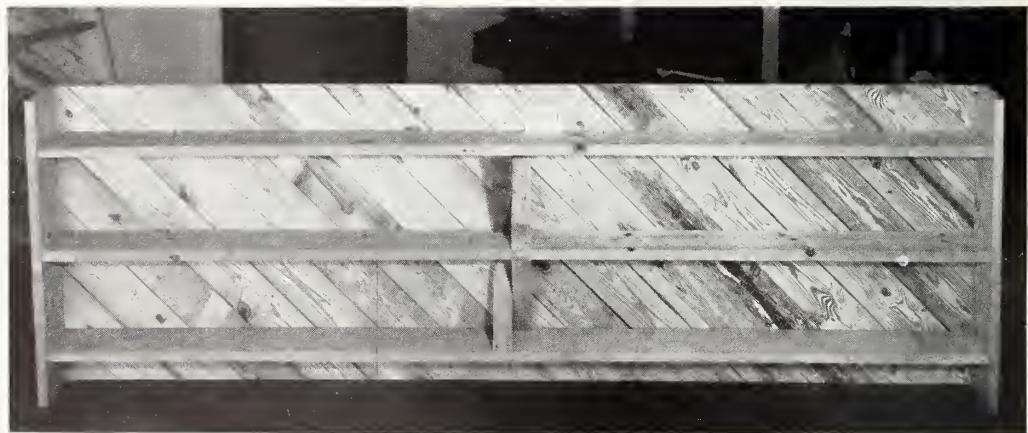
Under side of floor specimen QB before plastering, showing construction.
